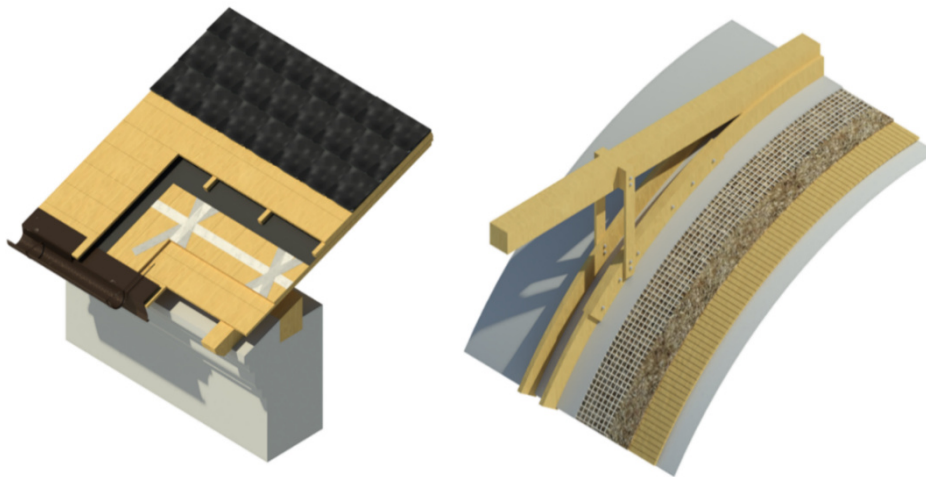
Grana-Pievani Manor, in Tirano: constructive details represented in HBIM model
